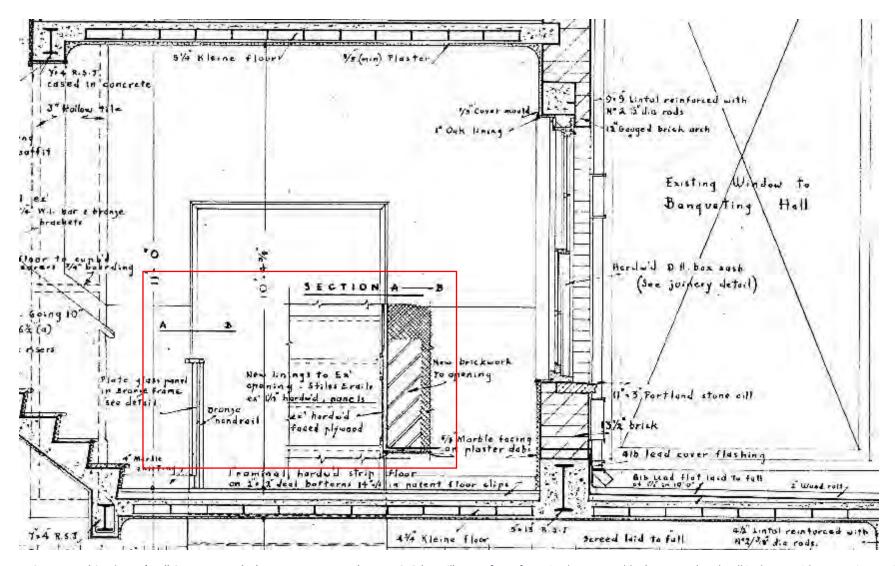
Proposed Stationers' Hall Court Room Block, Henry Dawson, February 1952 (Detail). West face of opening between Lobby (Anteroom) and Hall is shown, with annotation stating 'New Linings to Ex' opening. Stiles and rails ex' ¼' hardw'd, panels ex' hardw'd faced plywood'. New brickwork to the opening (Section through LHS is drawn on the RHS of the doorway) also indicates reduction or, perhaps more likely, consolidation of Mylne's closing-up.
